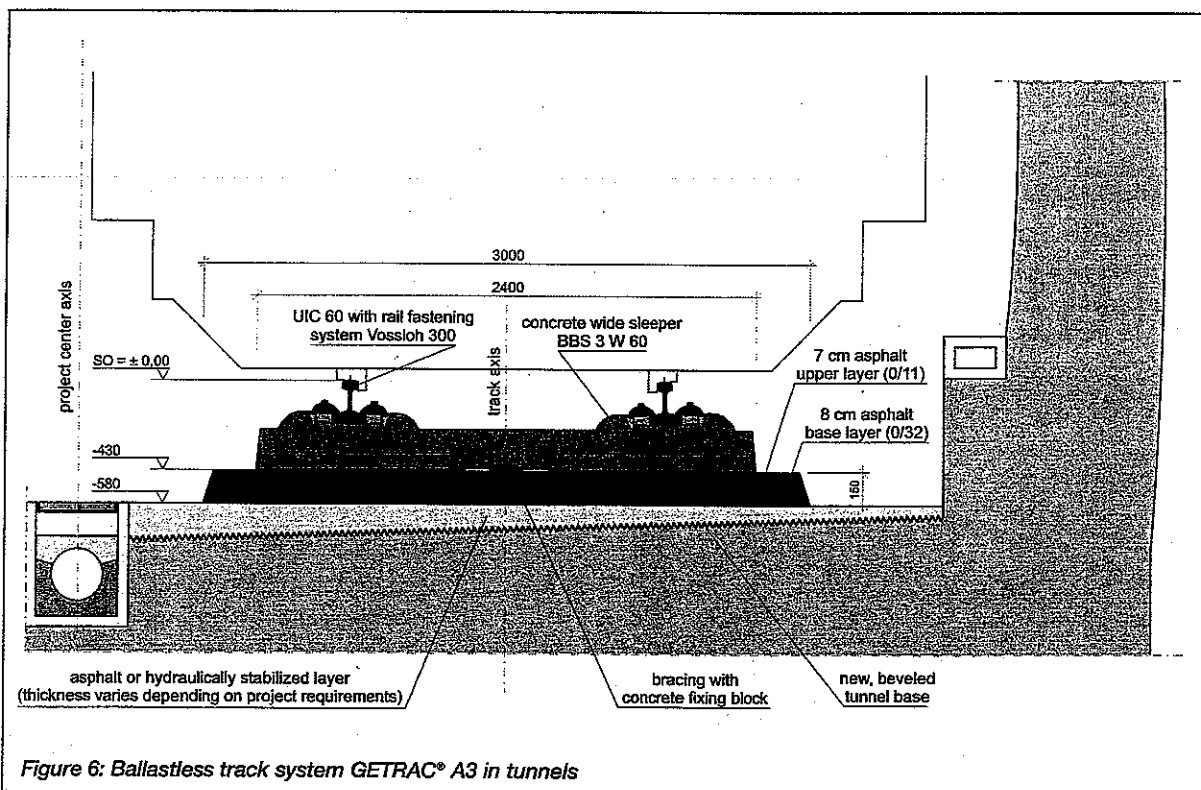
Ballastless track system GETRAC® A3 in tunnels
